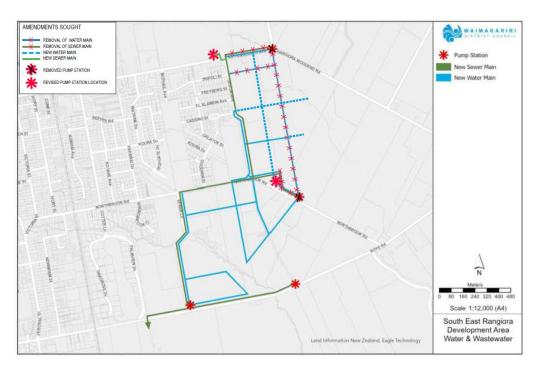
B-5. Bellgrove Changes Sought to the South East Rangiora Water and Wastewater Outline Development Plan
